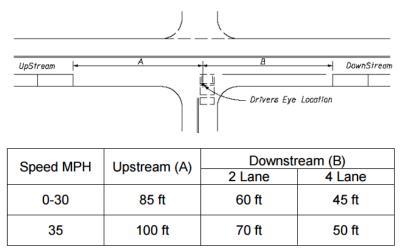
On-street parking sight distance [FDOT. Florida Median Handbook. 2014]
